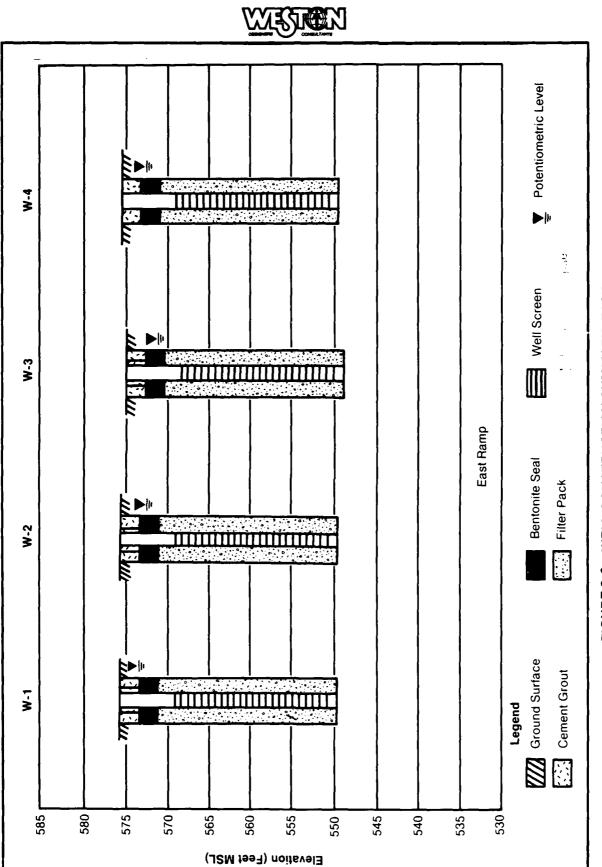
WELL CONSTRUCTION SUMMARY, EAST RAMP
